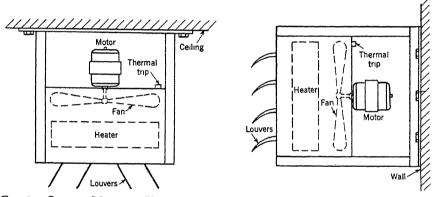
Ceiling Mounted Unit Heater Fig. 2. Wall Mounted Unit Heater
